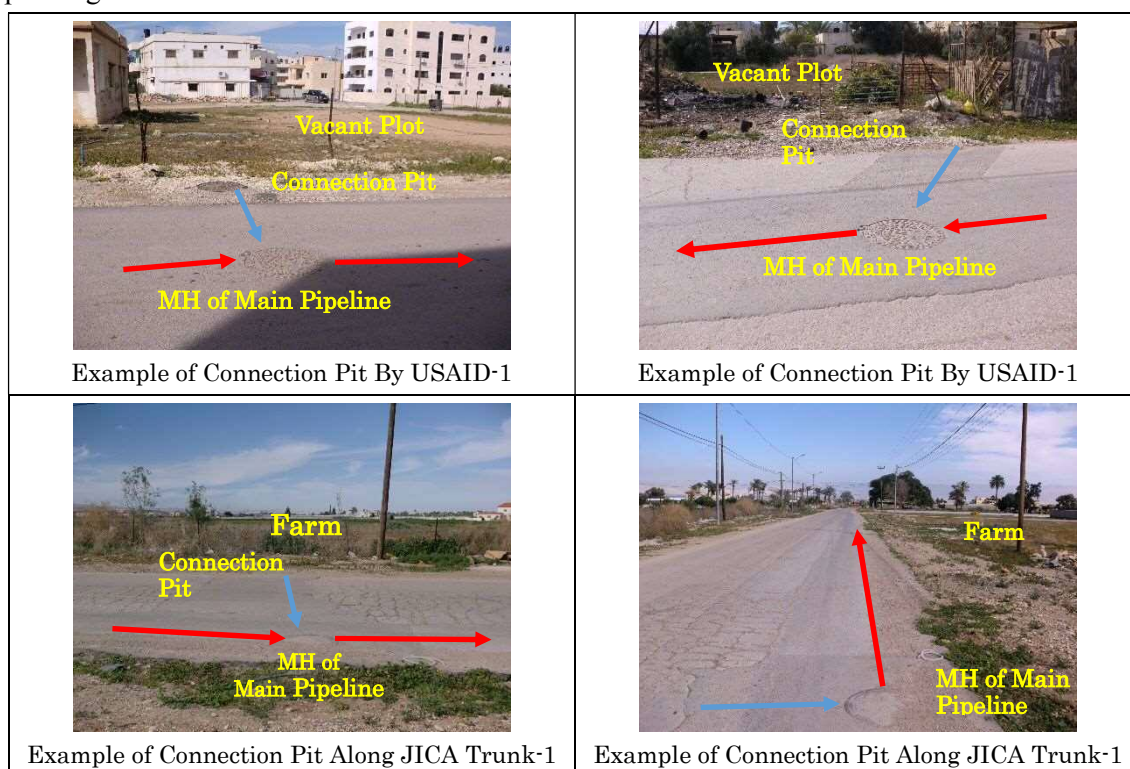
Vacant Premise Conditions with installed Connection Pit
